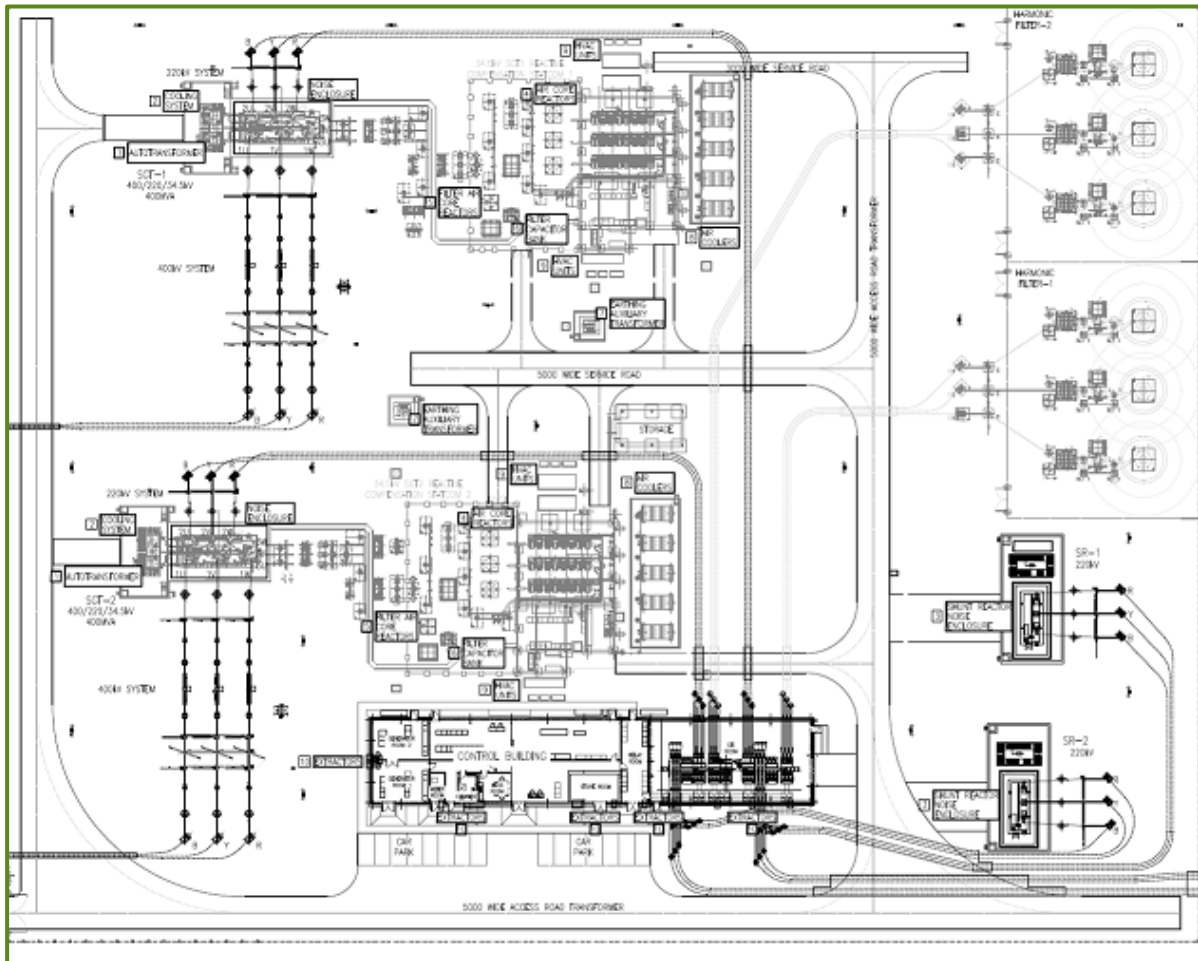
Indicative Onshore Substation Layout – HVAC
